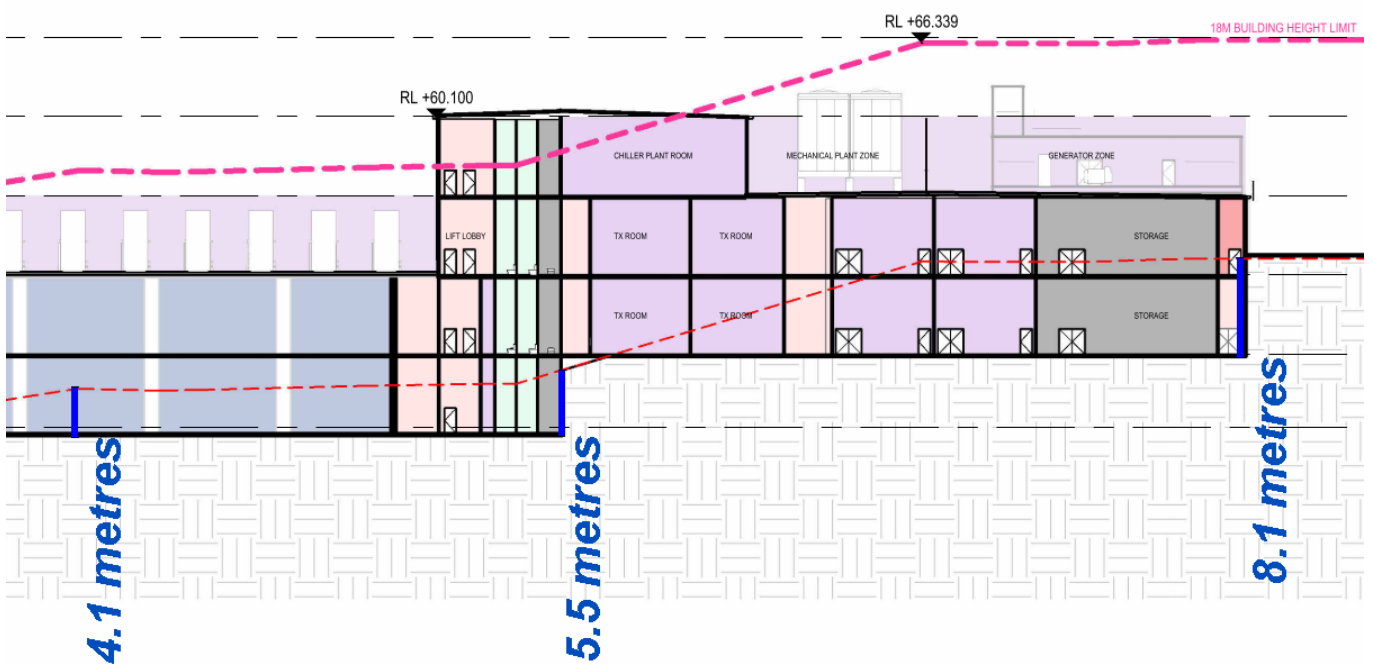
Section through the site with existing ground level in dashed red and levels of excavation depicted in blue (Source: Architectural Plans)
